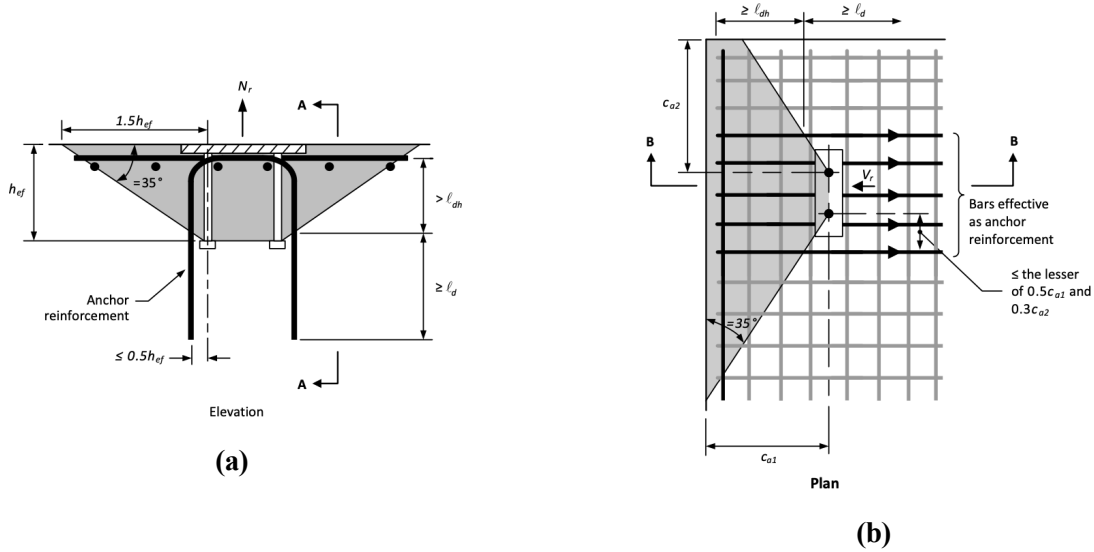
Supplementary reinforcement for anchors loaded in (a) section view of tensile loading and (b) plan view of shear loading (CSA, 2019)
